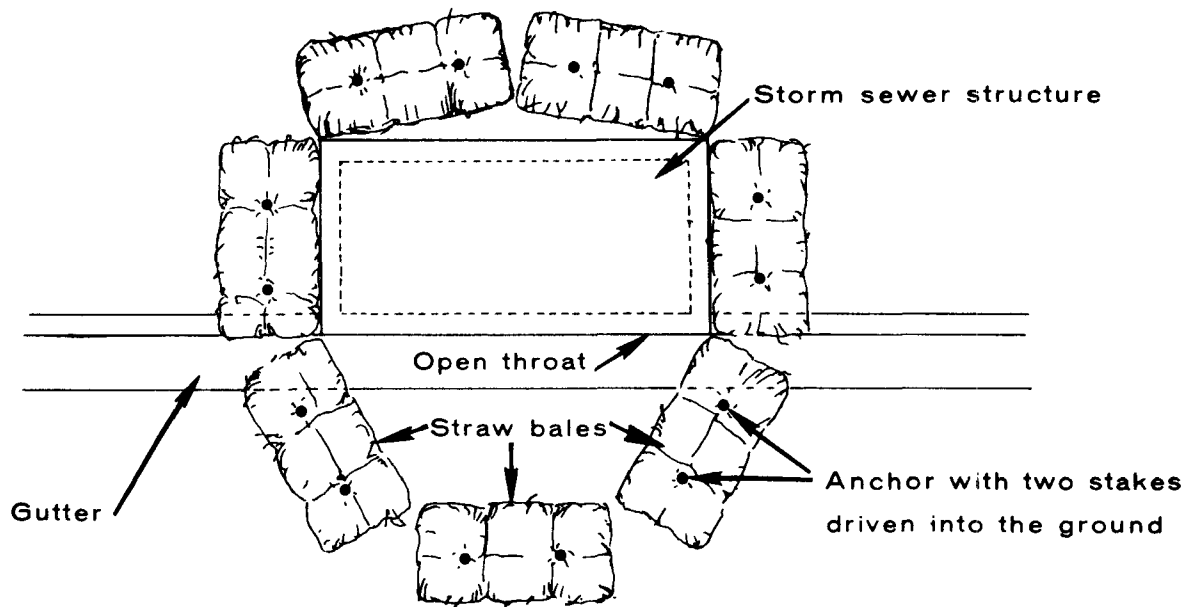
Temporary Barrier of Hay Bales to Prevent Sediment-Laden Water From Entering Storm Sewer (Reference No. 17).
